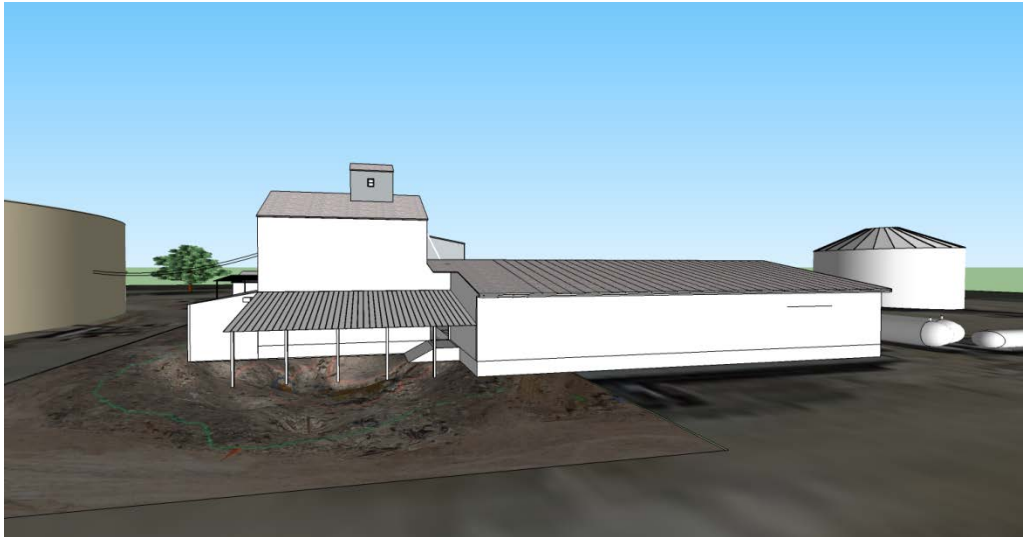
Elevation View of Fertilizer Building, with Crater Depth (Source: Atlas Engineering)
